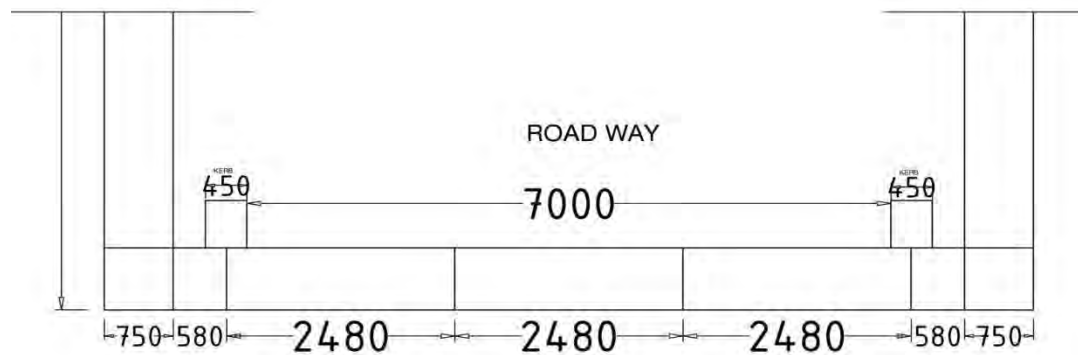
cross section of steel bridge showing deck and stringer in mm
